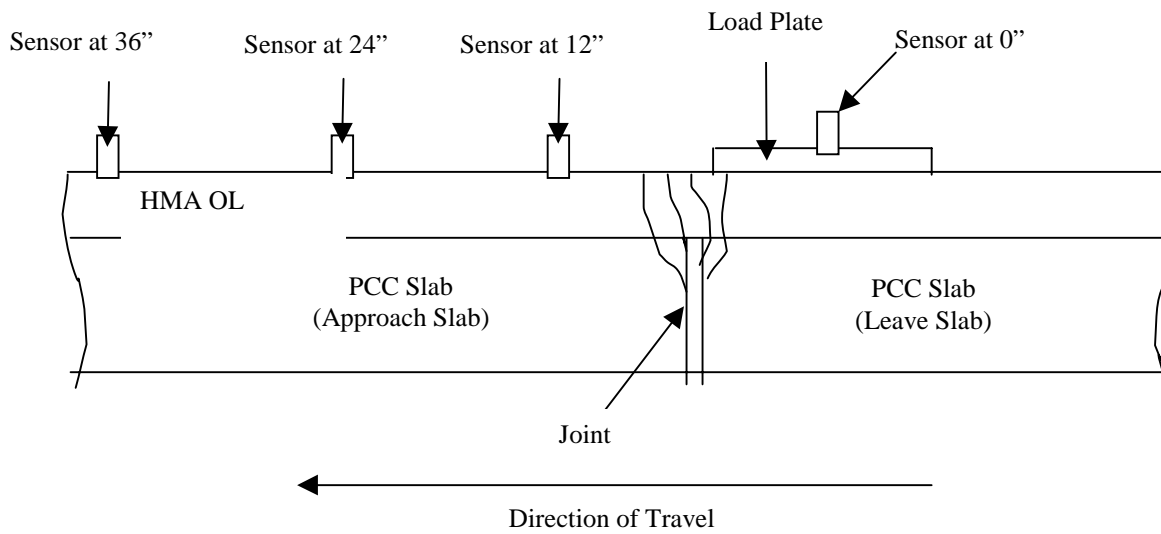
Joint Load Transfer Testing Sensor Spacing ID #8
